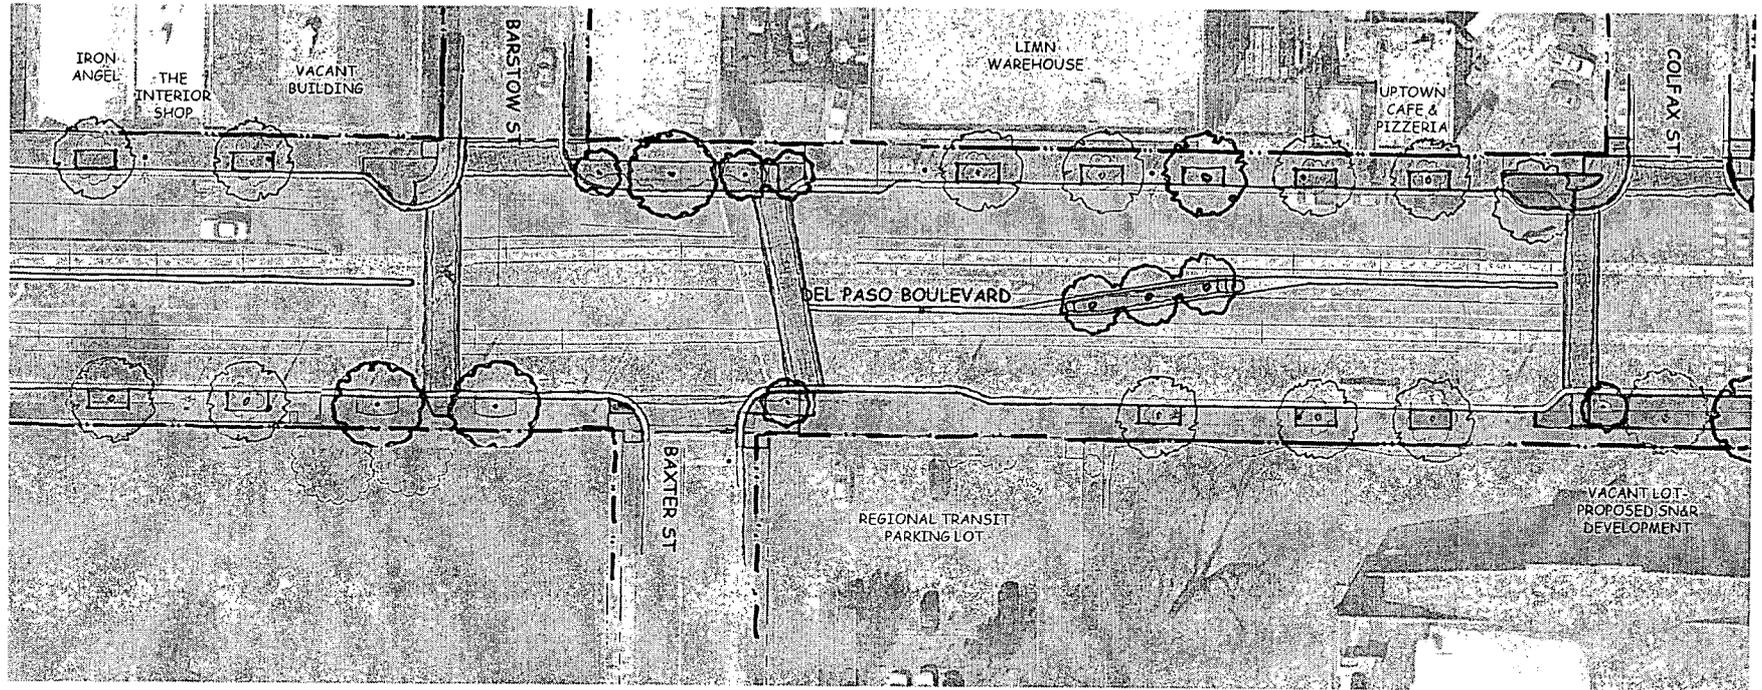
% Design Plans – Colfax Street to Dale Avenue
